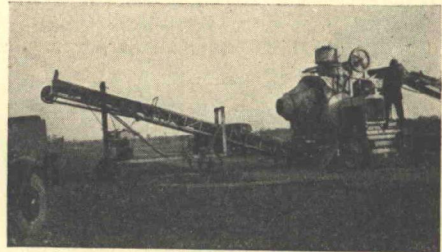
Concrete Mixer Set-Up in Plant Shown in Figure 9, at Ames, Iowa
